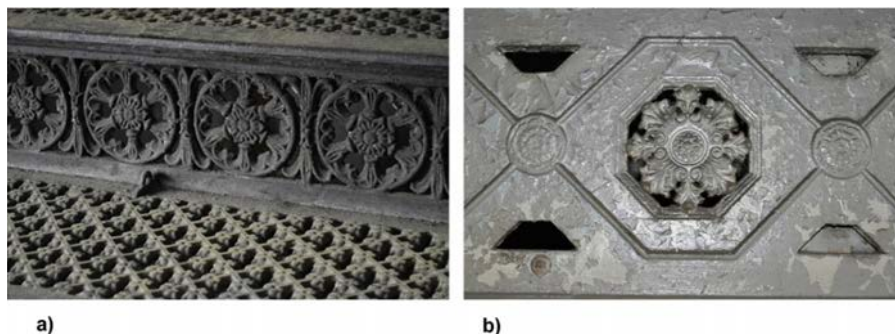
Cast iron staircase, ornament: (a) the stair riser and the stair tread; (b) the main load bearing beam (B1).
